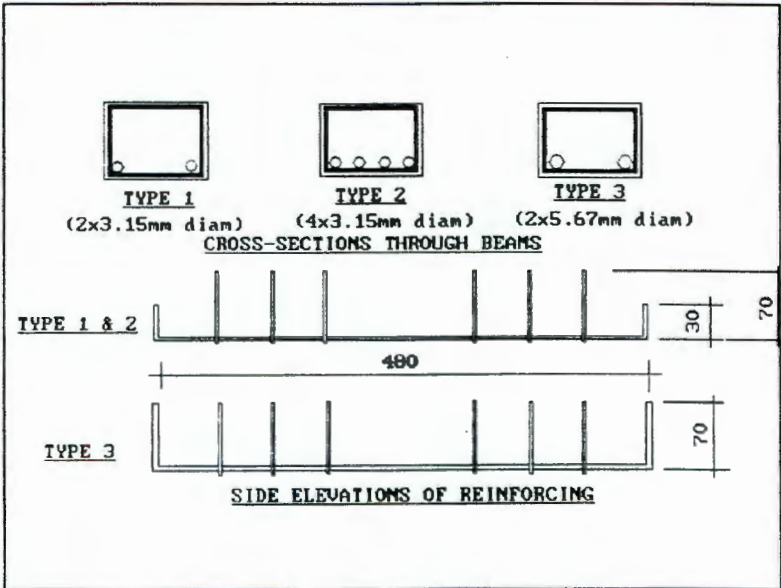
TYPE 1 REINFORCEMENT ARRANGEMENT
